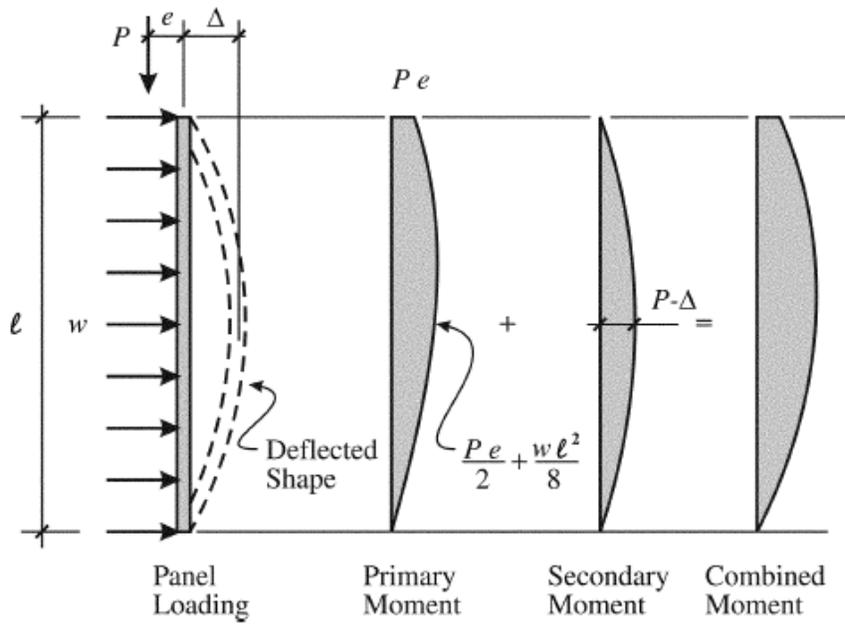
Wall design model (Source: ACI 551.2R10)
